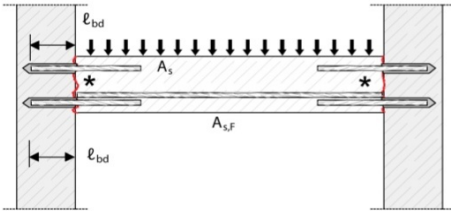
Anchoring of reinforcement to cover the line of acting tensile force.
